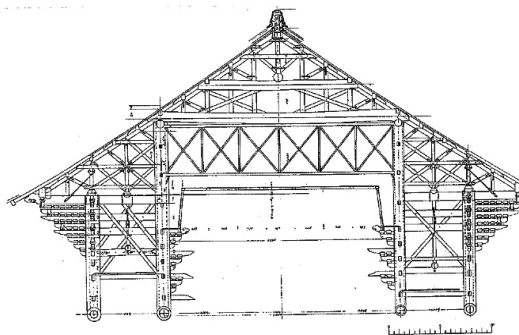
Daibusuden of Todai-ji: sectional detail of restored and rebuilt truss after Meiji restoration project (Coaldrake, 1994)
